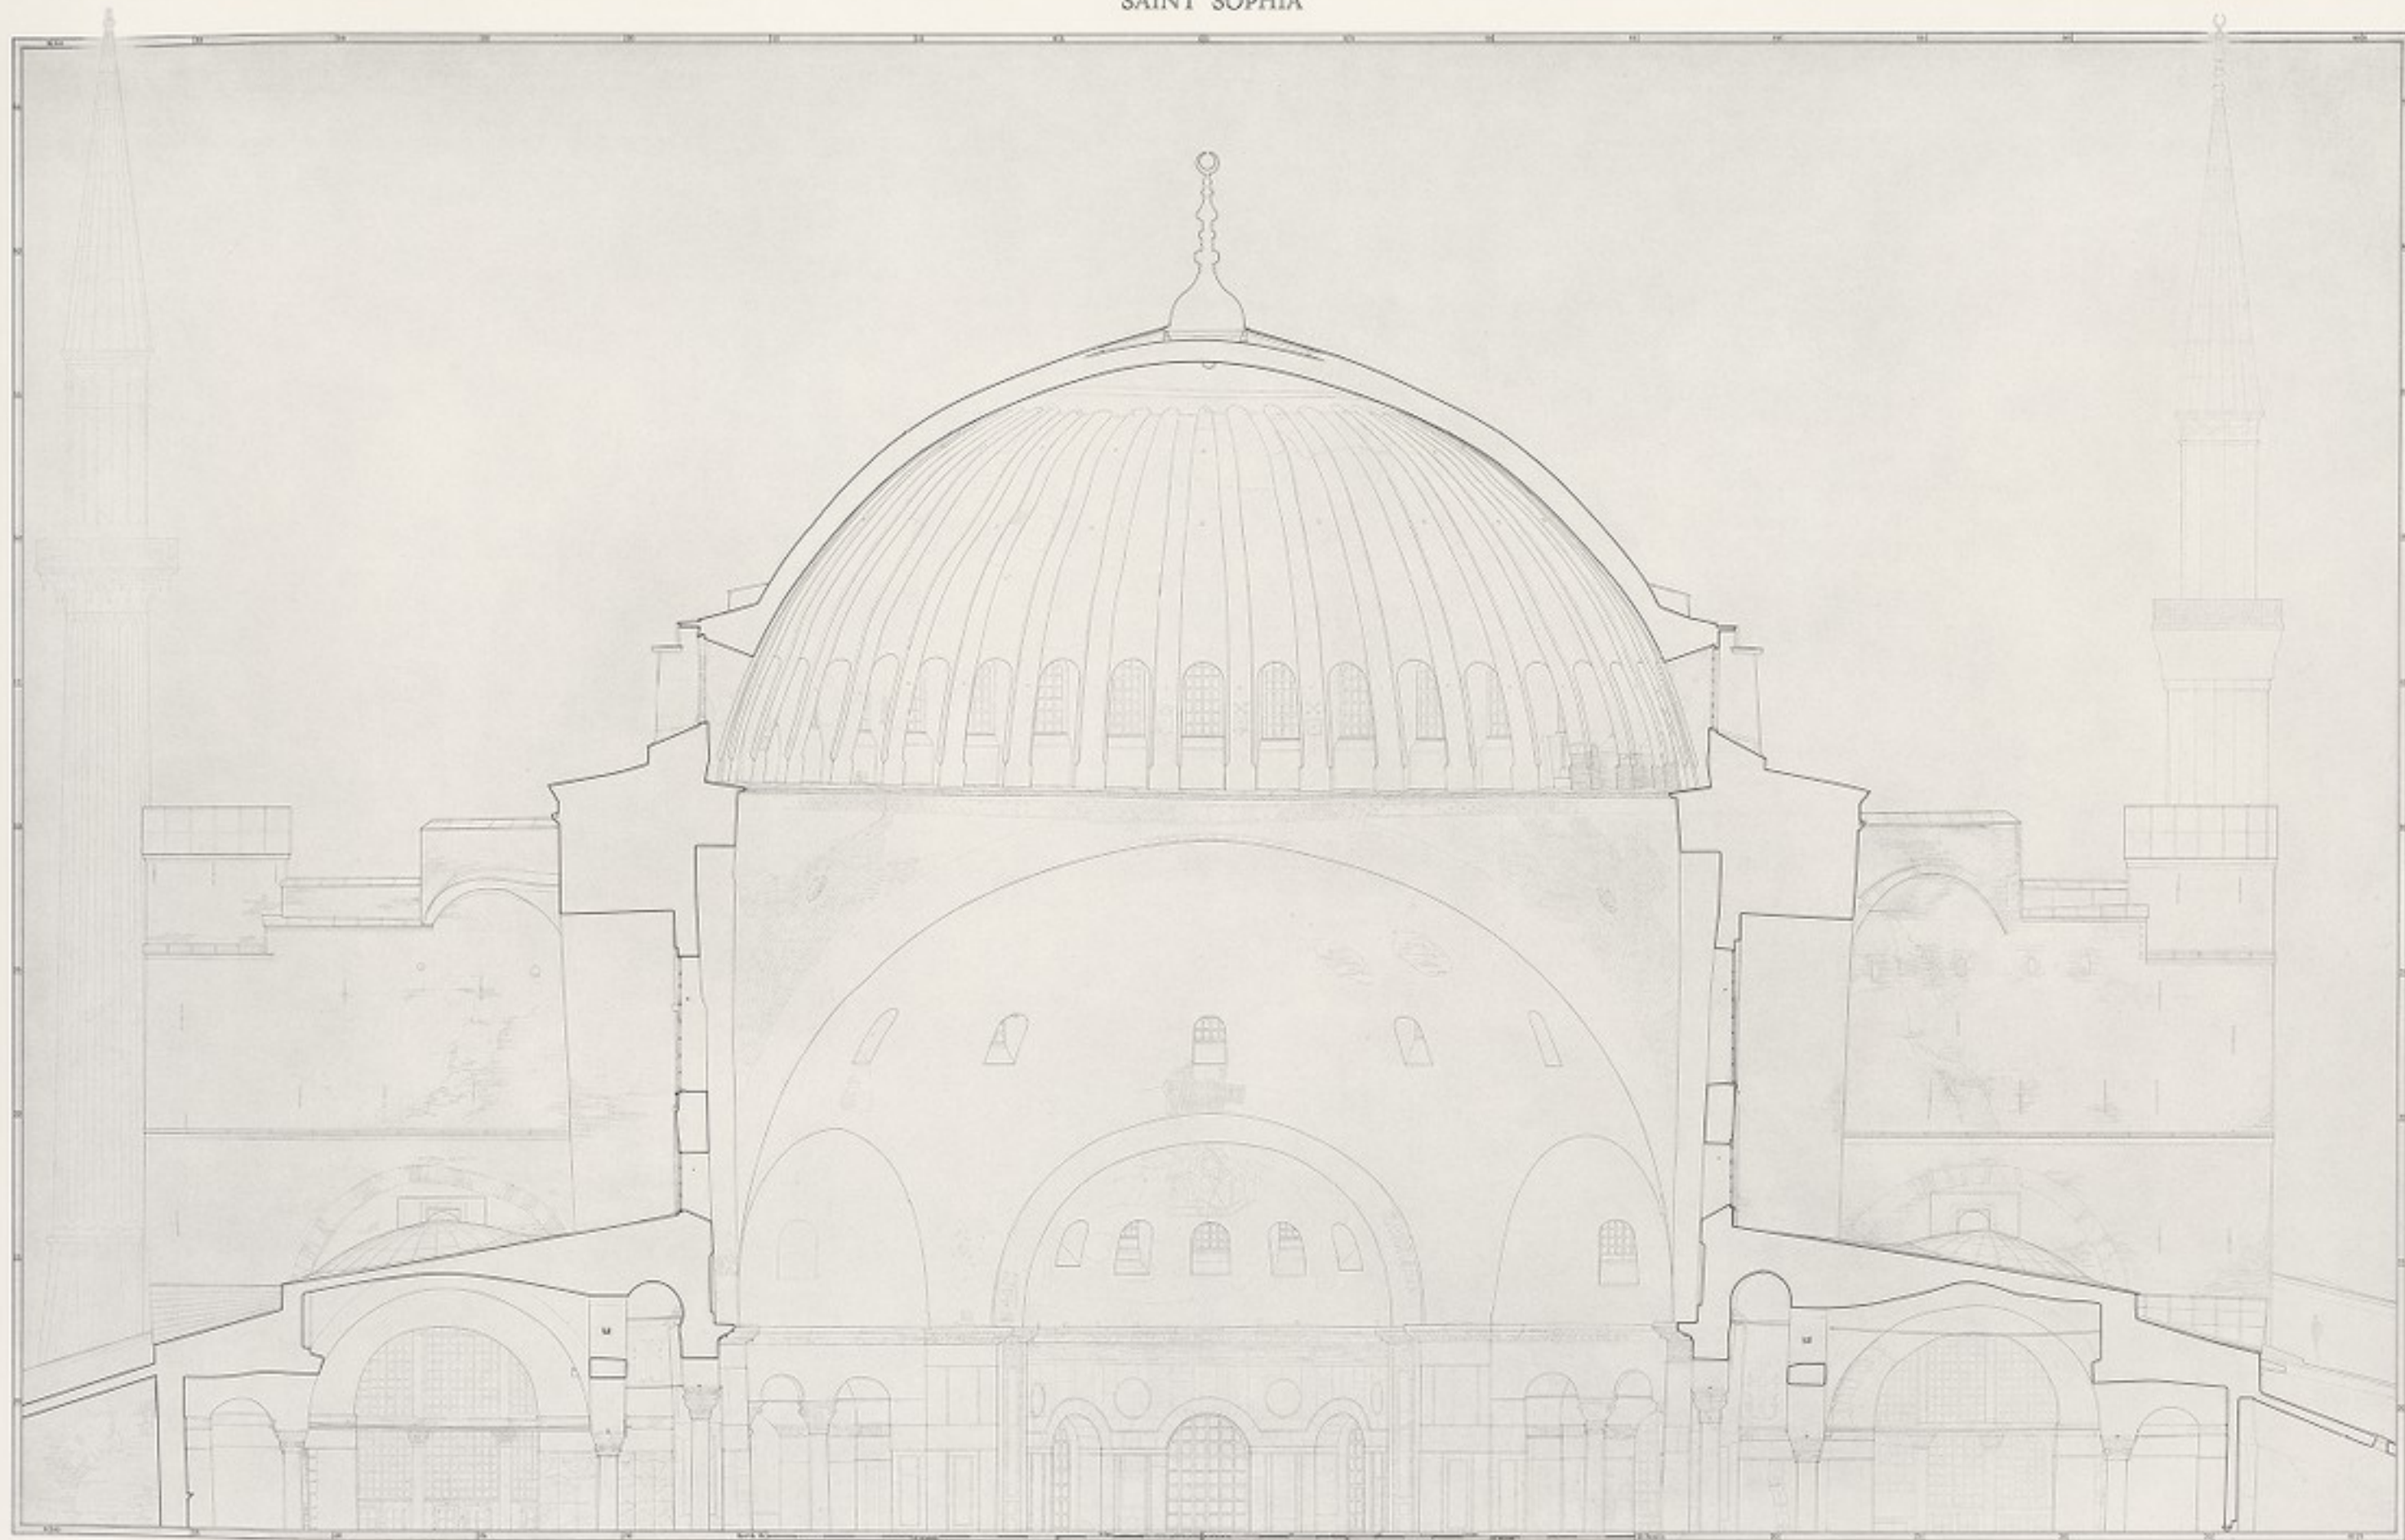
TRANSVERSE SECTION, LOOKING EAST
